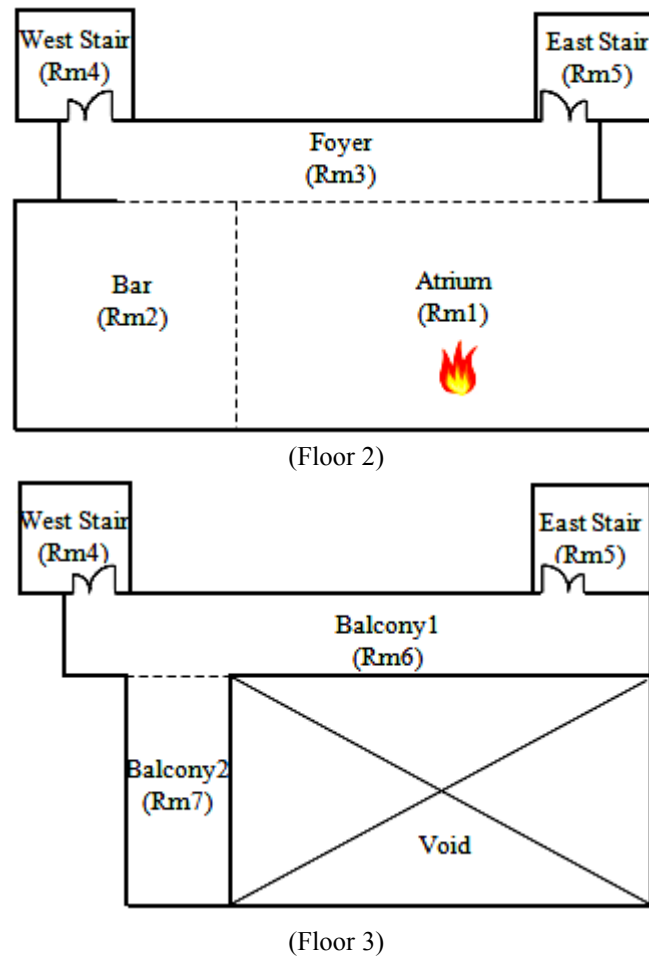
Geometry as modelled in BRANZFIRE – Atrium fire on Floor 2&3
